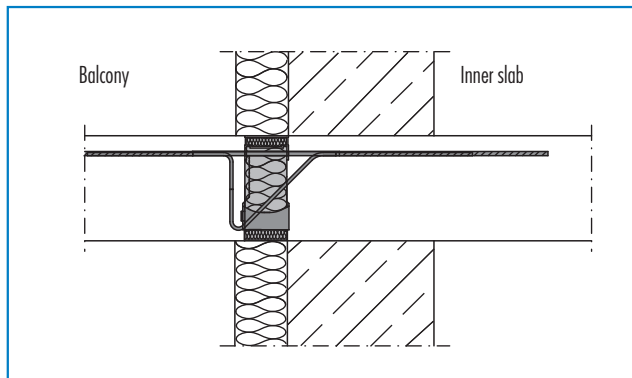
Brickwork with external insulation and a balcony at inner slab level
